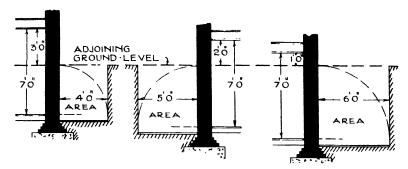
Underground rooms (London). Minimum height of room, height above adjoining ground surface, and width of area.
